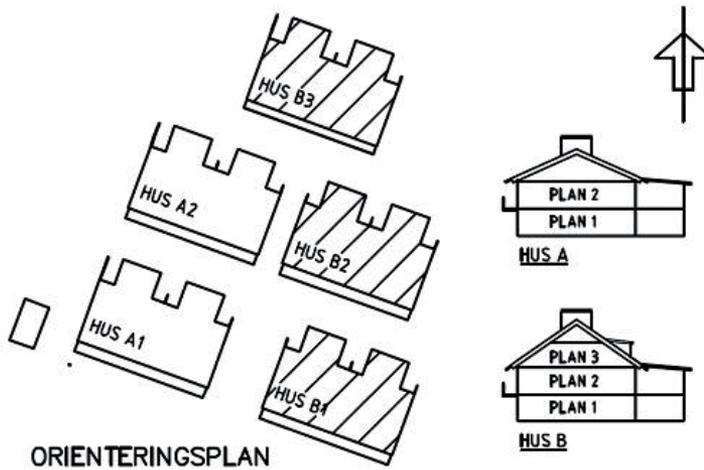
Plan of the Oxtorget area and sections of the buildings (Drawing: bsv arkitekter).
